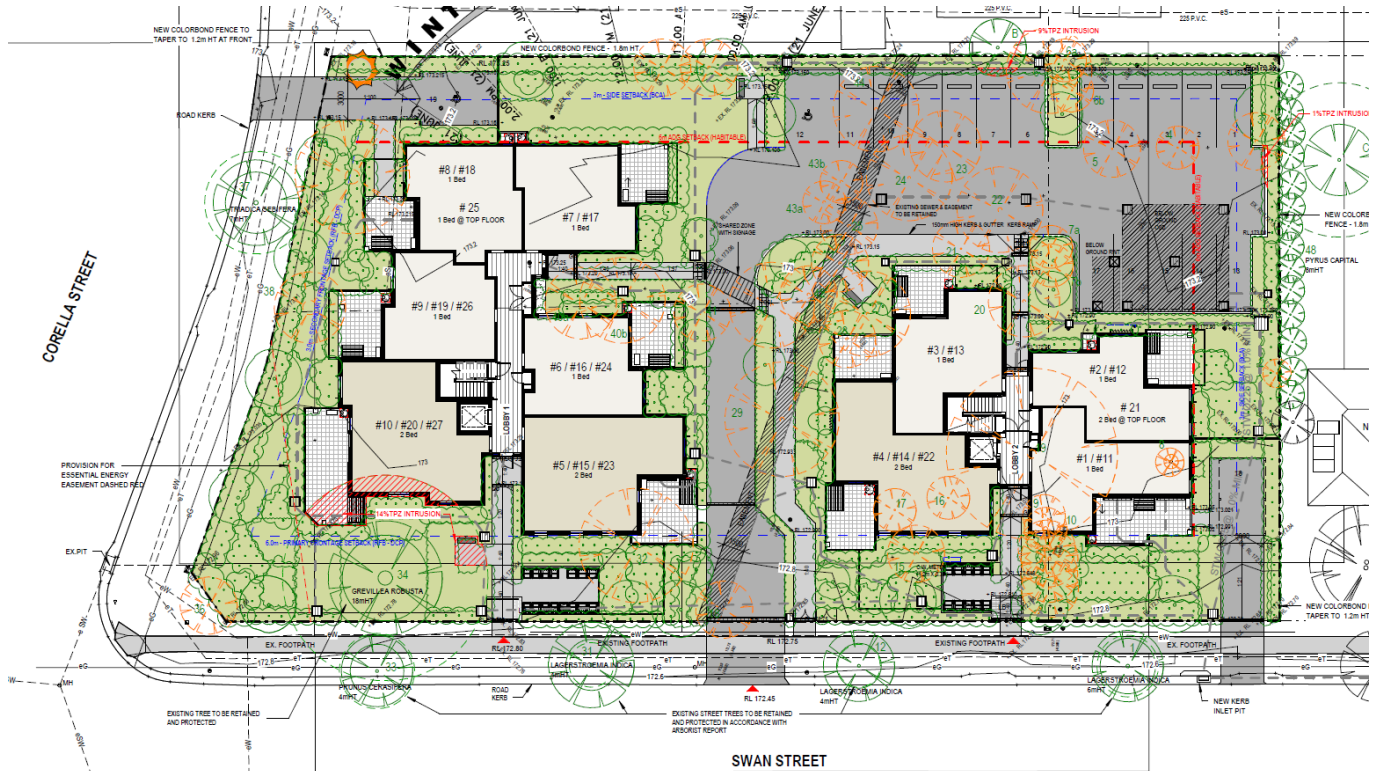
Extract from Architectural Plans – Site Plan (Source: Architectural Plans, Brewster Murray Pty Ltd, dated 7/02/2025)
